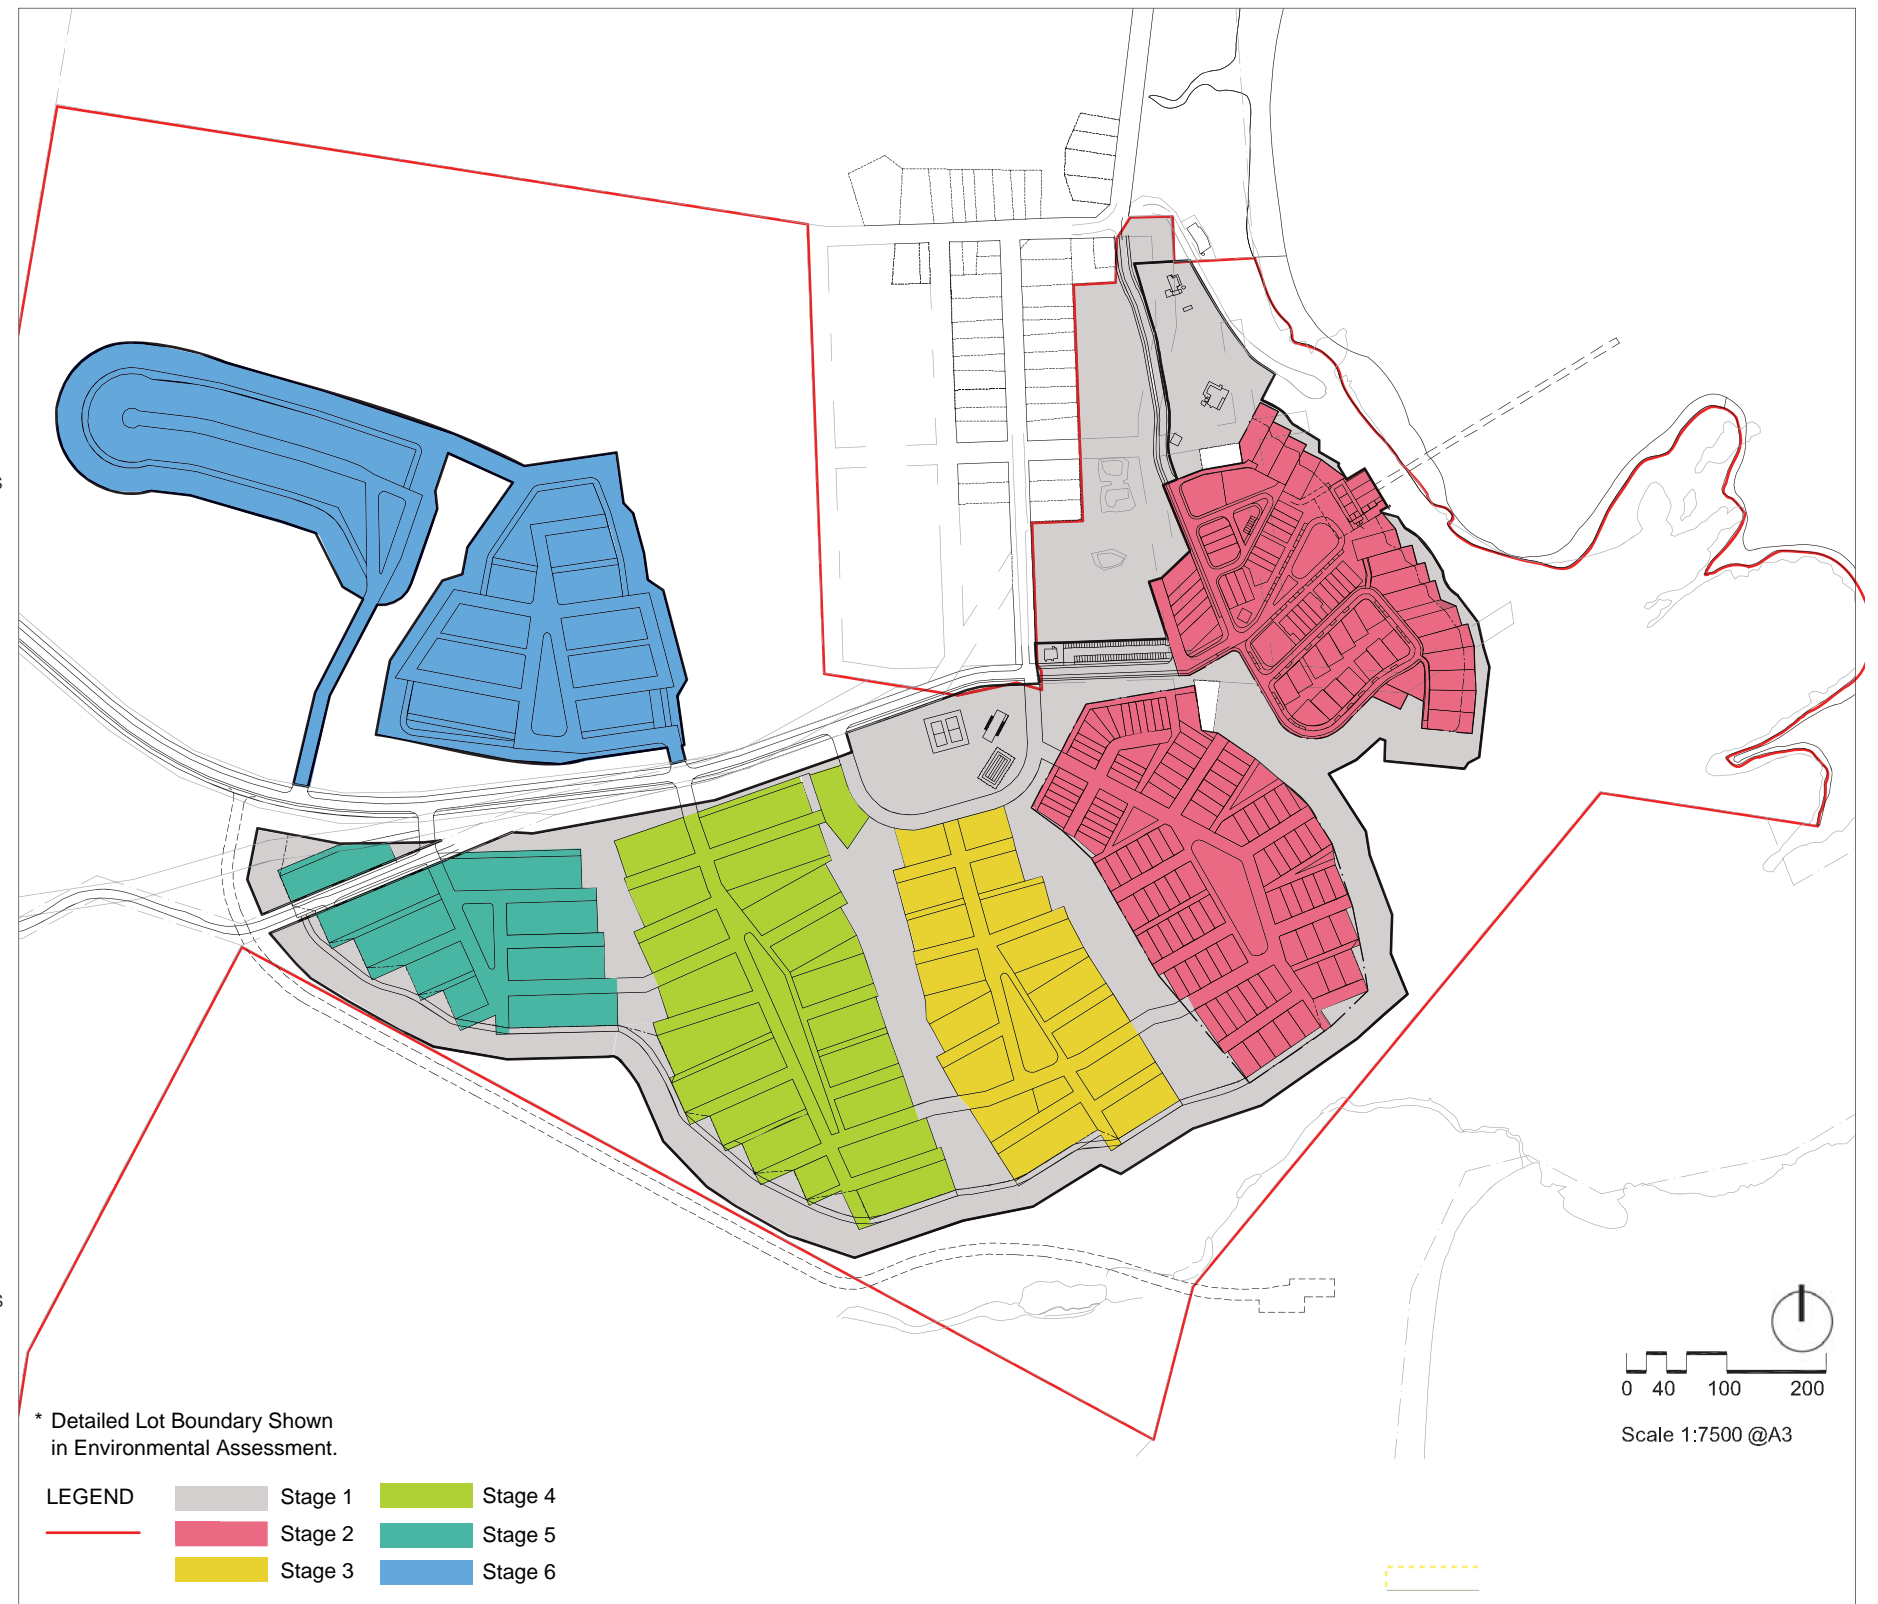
The Moonee Hamlets Staging Plan.
